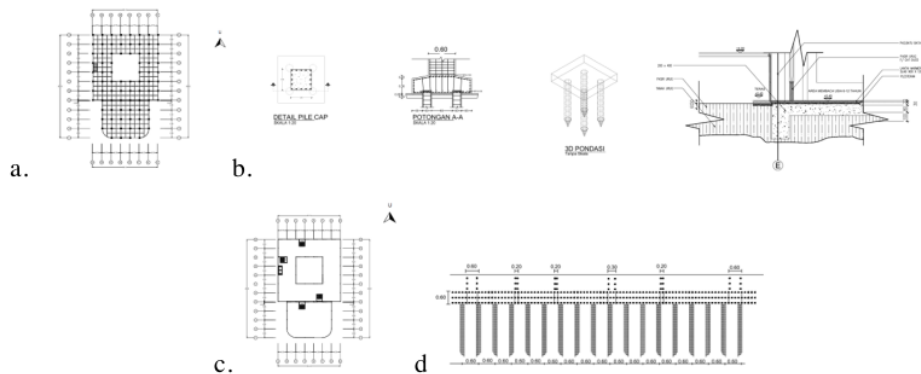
a. Pondation Plan; b. Detail Pondation, Dilatation Detail; c. Core Plan; Detail Core Pondation (Pribadi, 2024)
